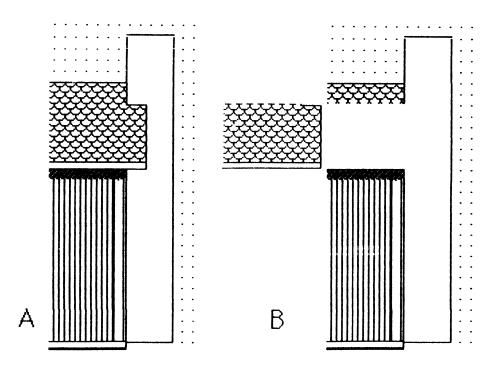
Removing a roof portion in order to add stonework to the chimney.
